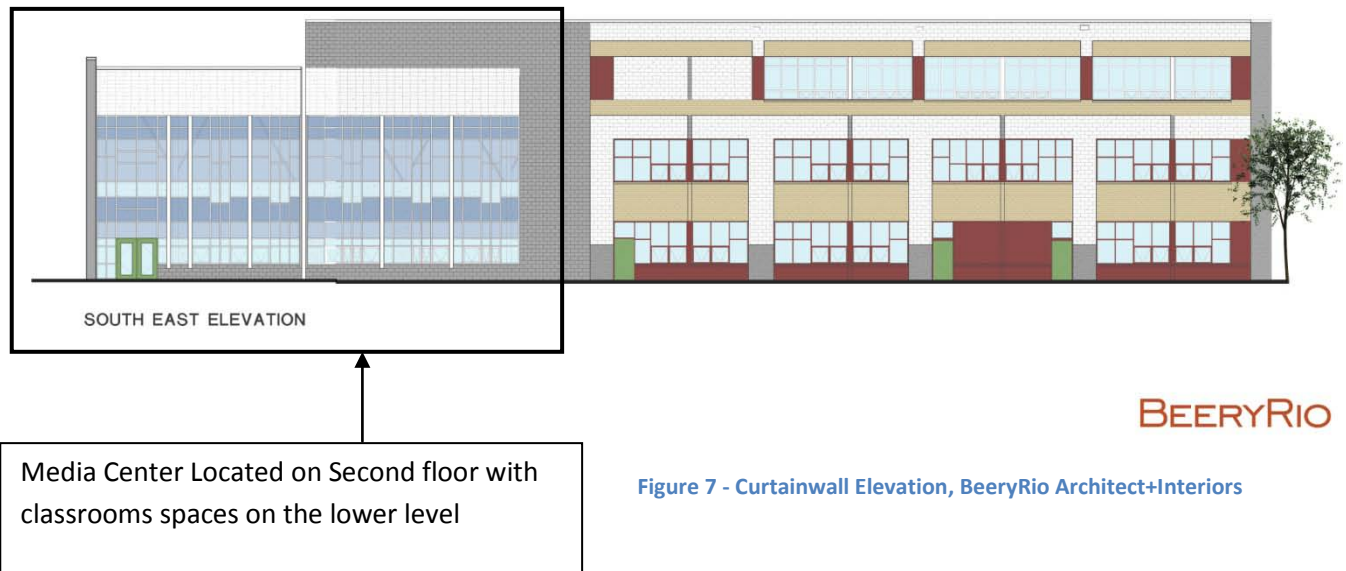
Curtainwall Elevation, BeeryRio Architect+Interiors
